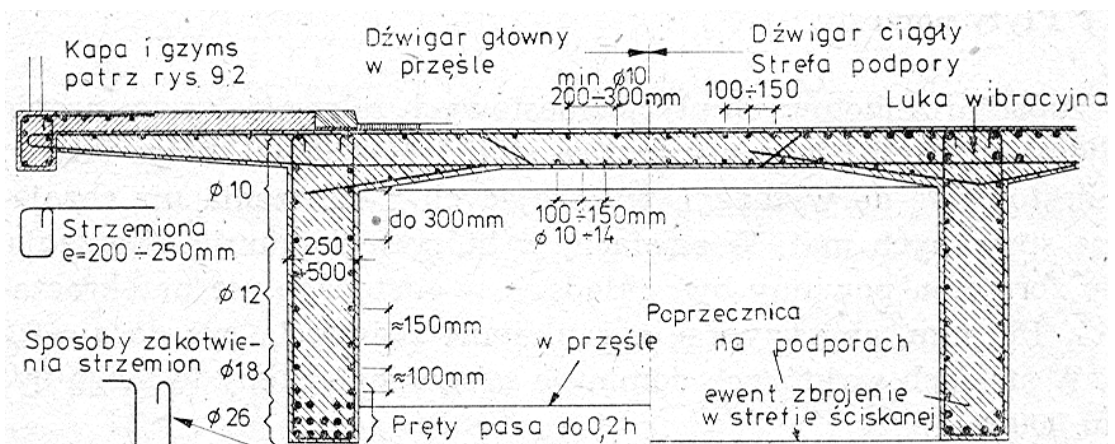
The reinforcing of continuous beam bridge; left – in span, right – over support, photo copy
